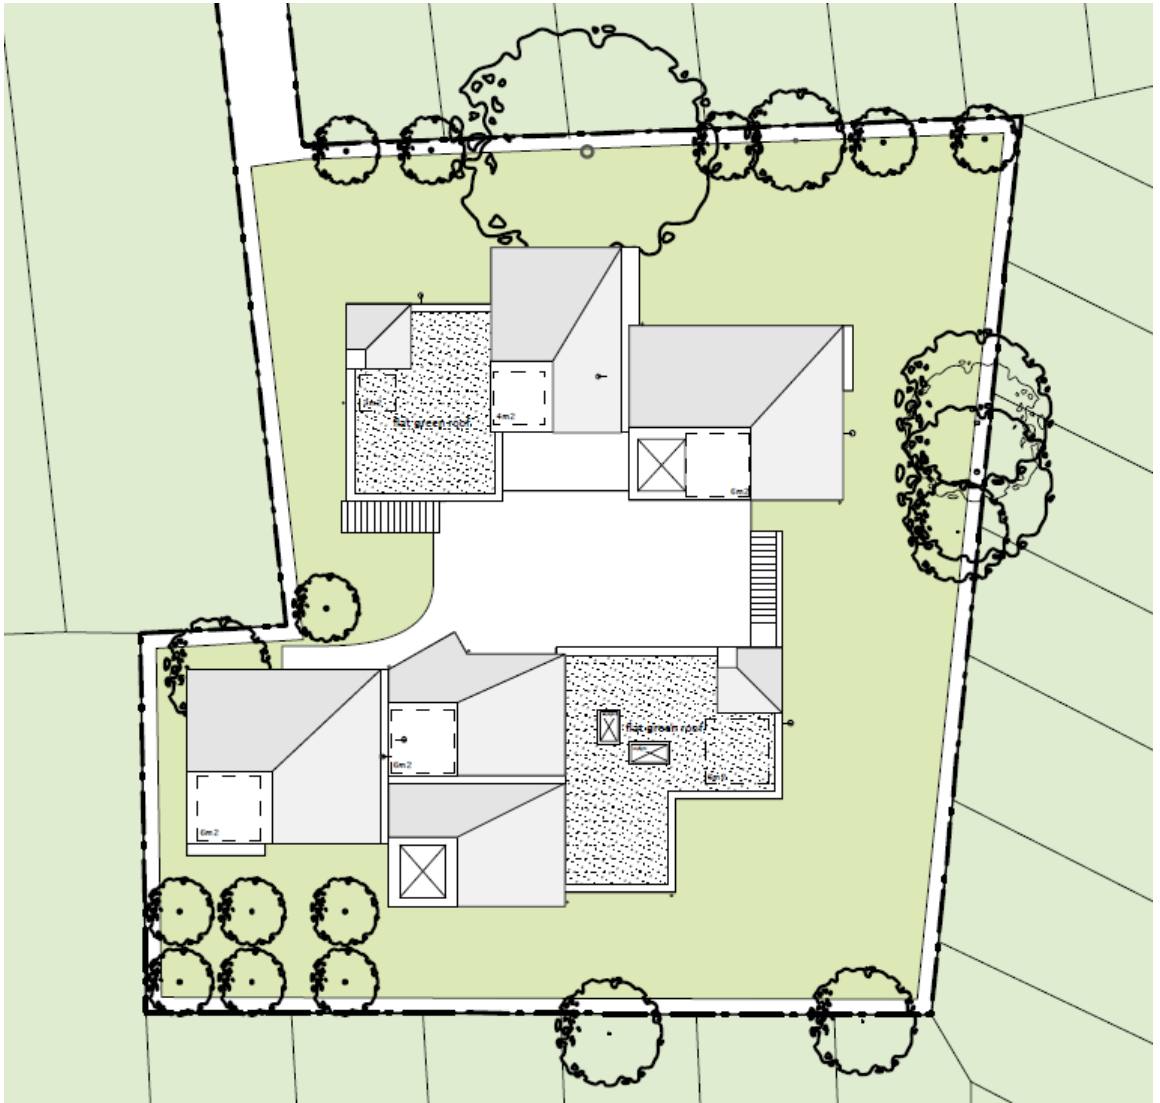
Site layout plan. Source: Copper Lane 2011 Planning application drawings.
